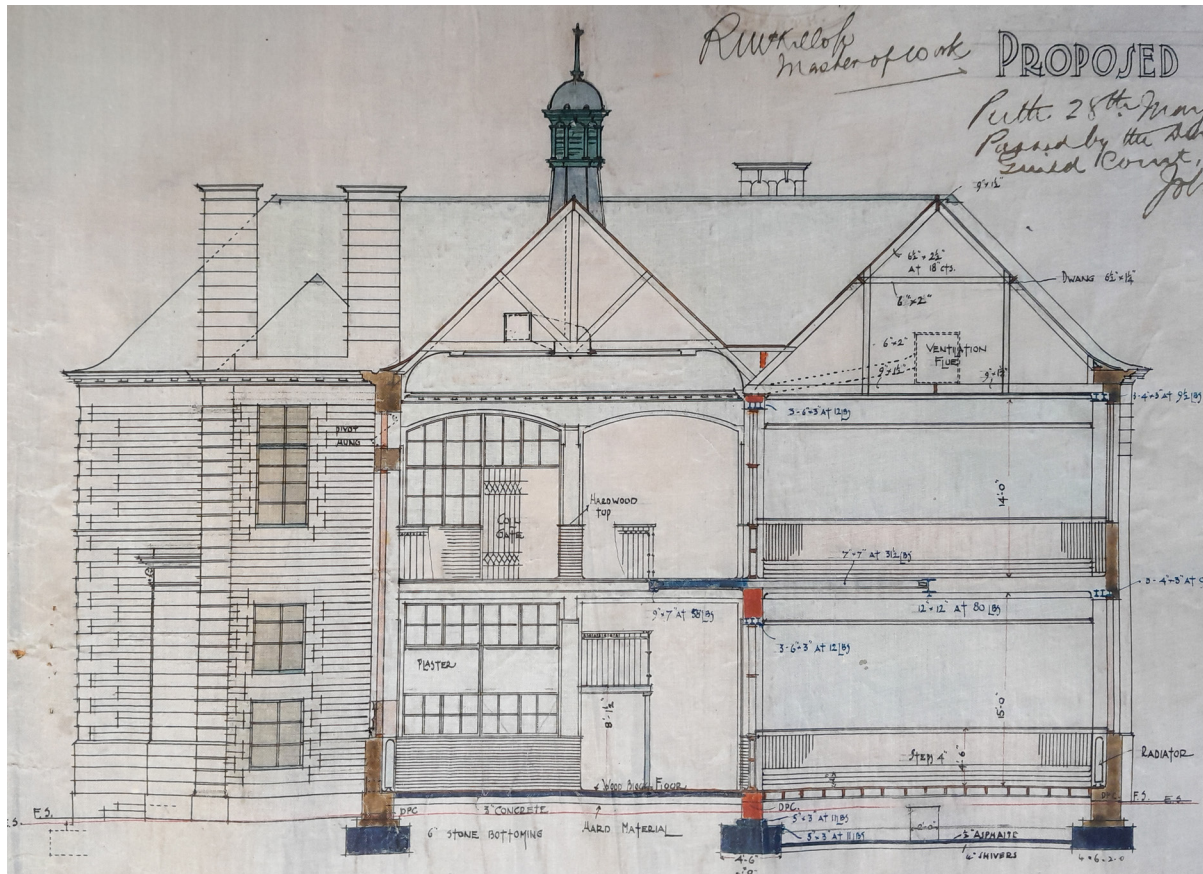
Original architect's NW/SE aligned section drawing showing proposed construction materials, looking north-east (reproduced by kind permission of the Perth & Kinross Archives. Reference: PE/DGP/1908/14i)
